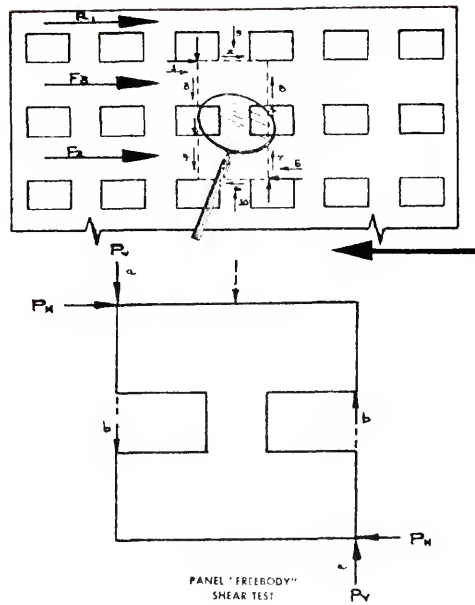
Forces acting on a pier element in a wall with opening.
